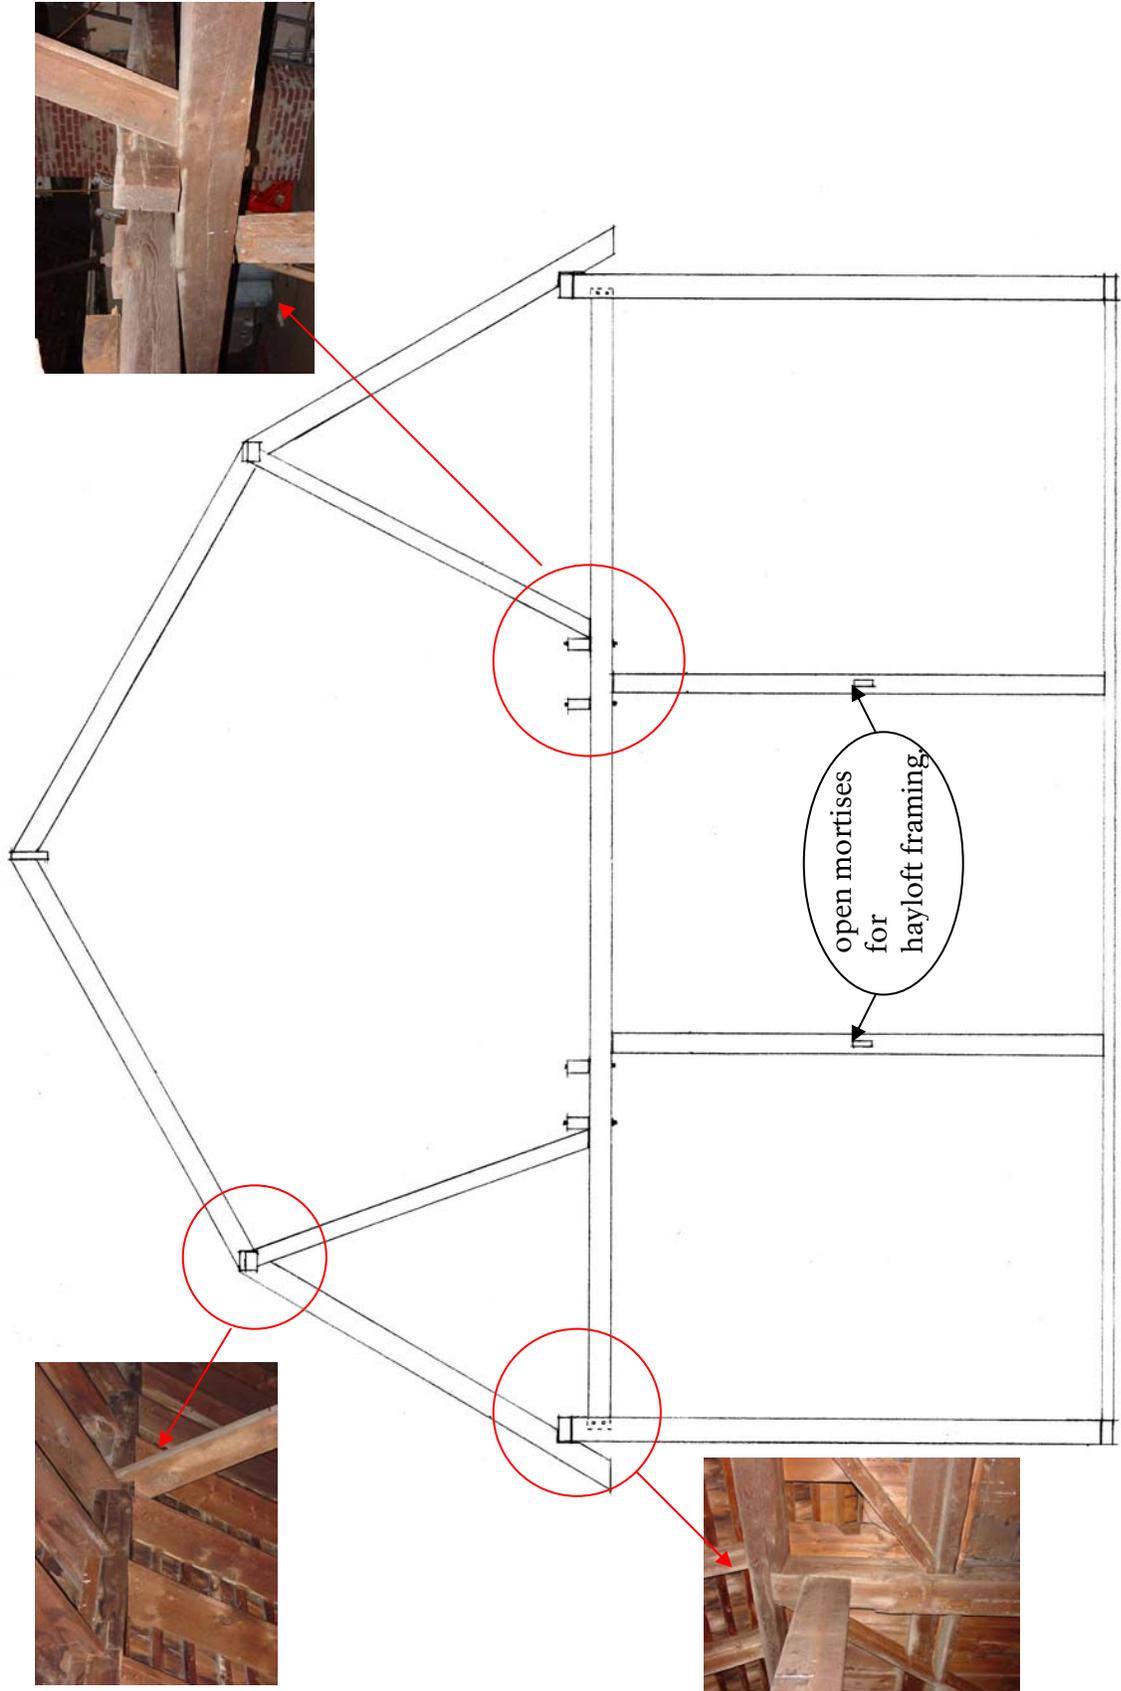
New Barn, east framing bent, depicting large timbers and typical roof construction and joinery (not to scale, 2005). The east bent is typical of the two middle bents, which define the central bay of the three-bay barn.
